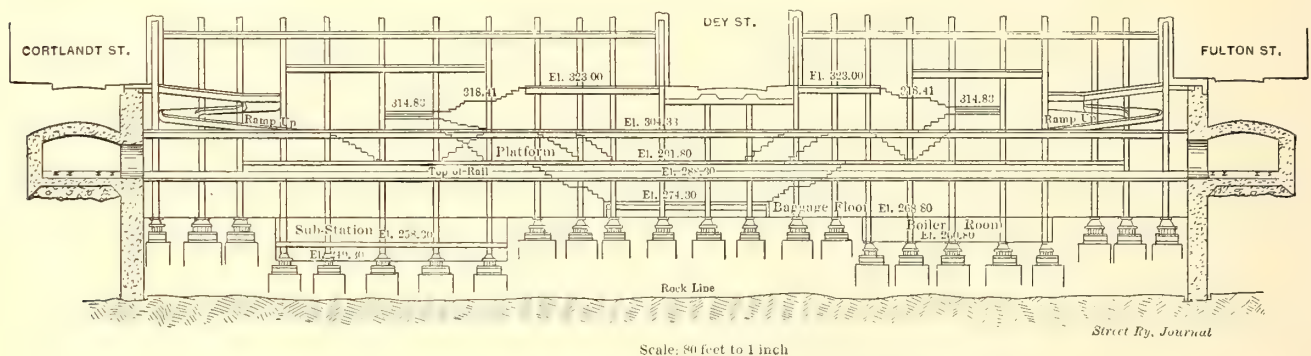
LONGITUDINAL SECTION OF CORTLANDT STREET STATION
